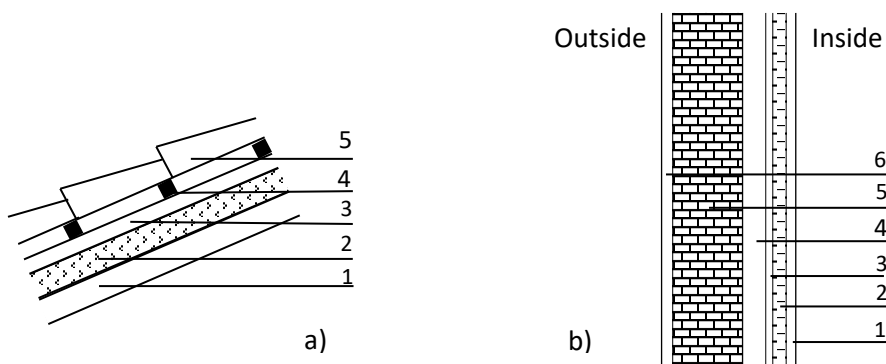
Constructive sections for walls and inclined roof with bamboo and cork (a – 1. Bamboo Structure, 2. Cork, 3. Underlayment, 4. Batten, 5. Clay roof tiles) (b – 1. Gyptec, 2 – ICB, 3 – Traditional plasterboard, 4 – Airbox with Bamboo, 5 – Brick, 6 – Traditional plasterboard).
